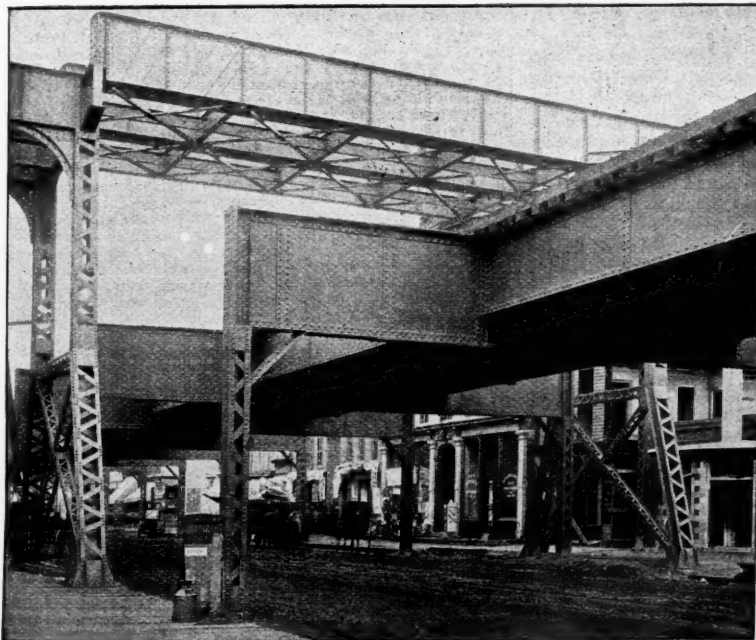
Crossing of Milwaukee Avenue branch of West Side Metropolitan Elevated over the Lake Street Elevated on Lake Street.
